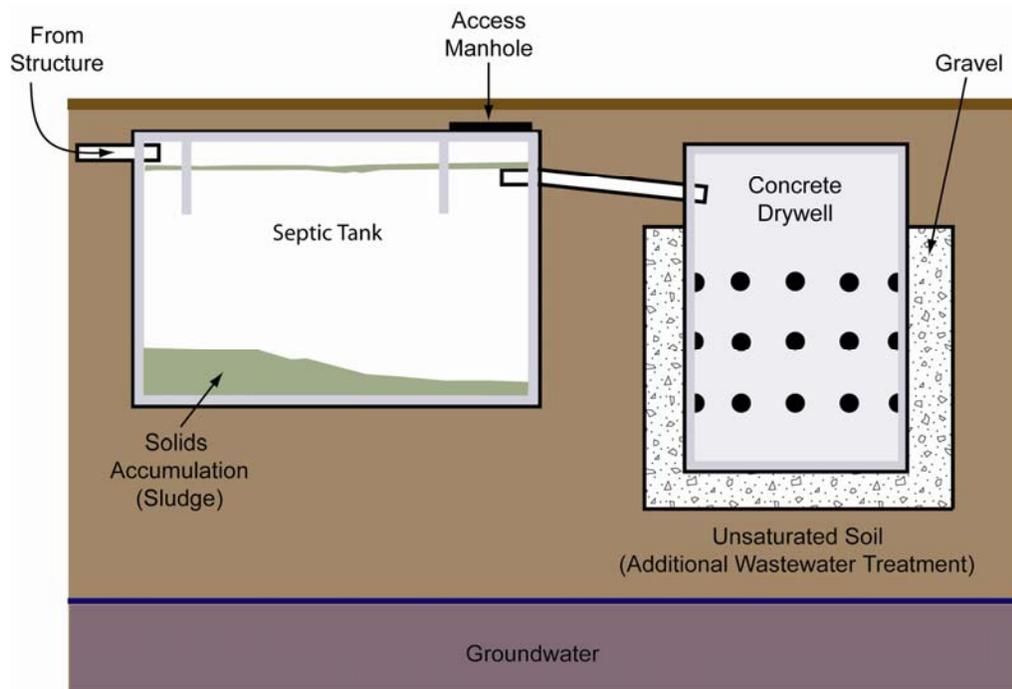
Schematic drawing of a legacy septic tank-seepage pit onsite wastewater treatment system.
